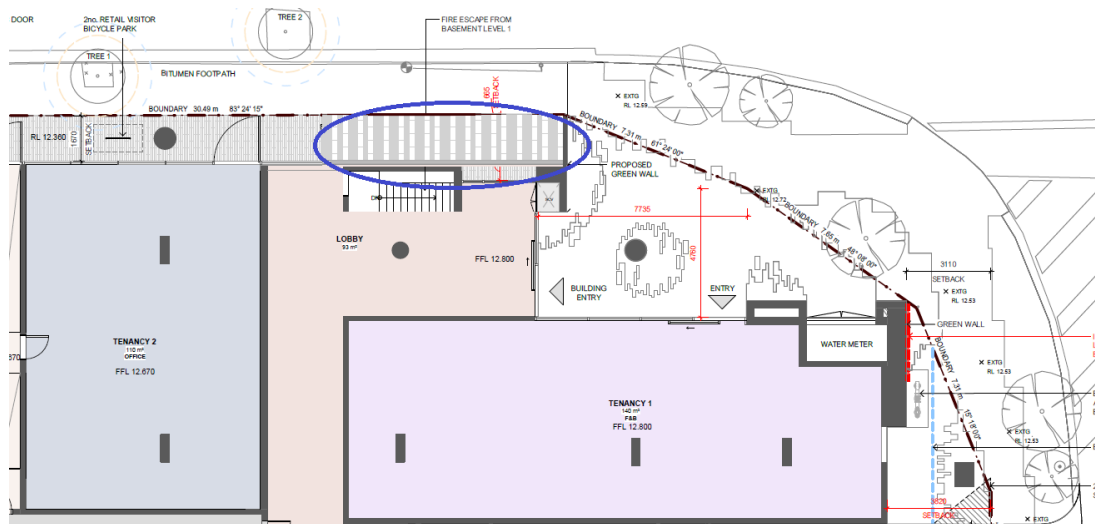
Ground floor plans - blue outline showing extension of ground setback
